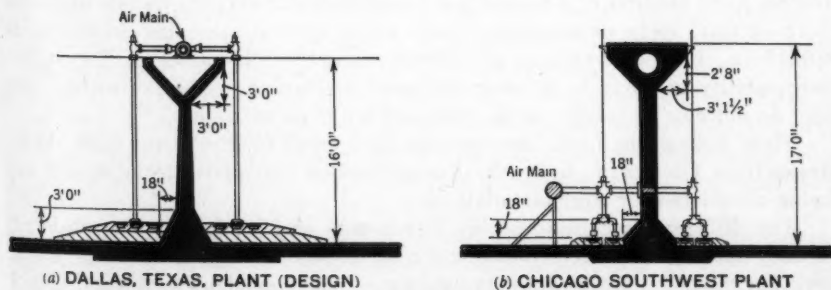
TYPICAL WALL SECTION SHOWING AIR PIPING AND DEFLECTORS
